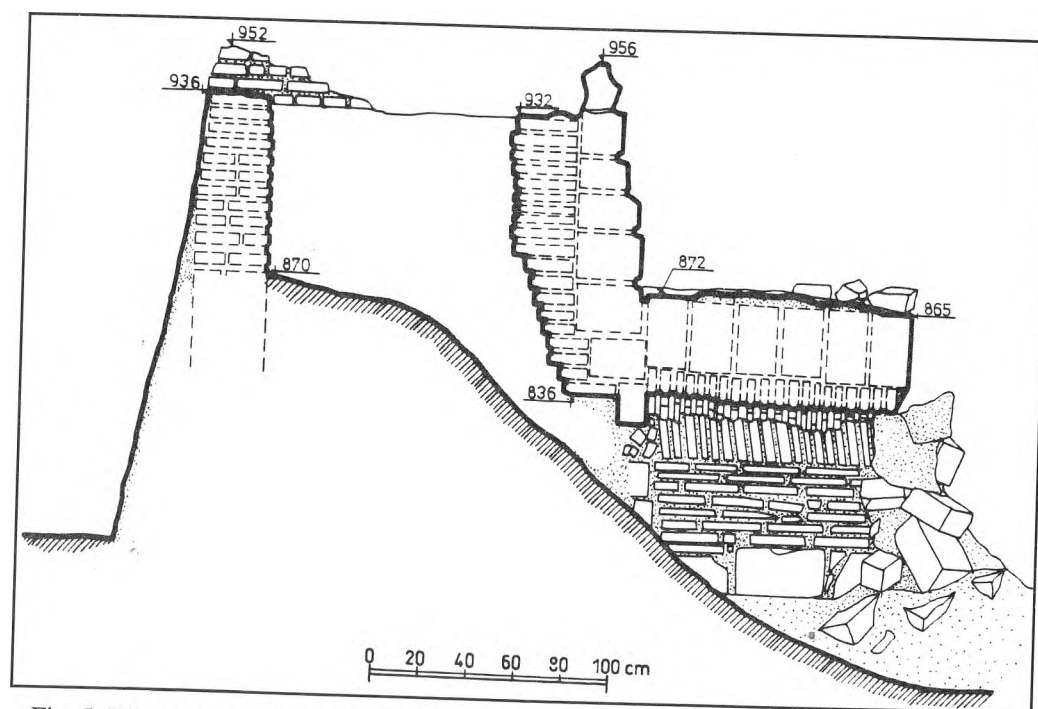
Kiln excavated in sector F. Cross-section E-W. Drawing by M. Budzanowski and M.
